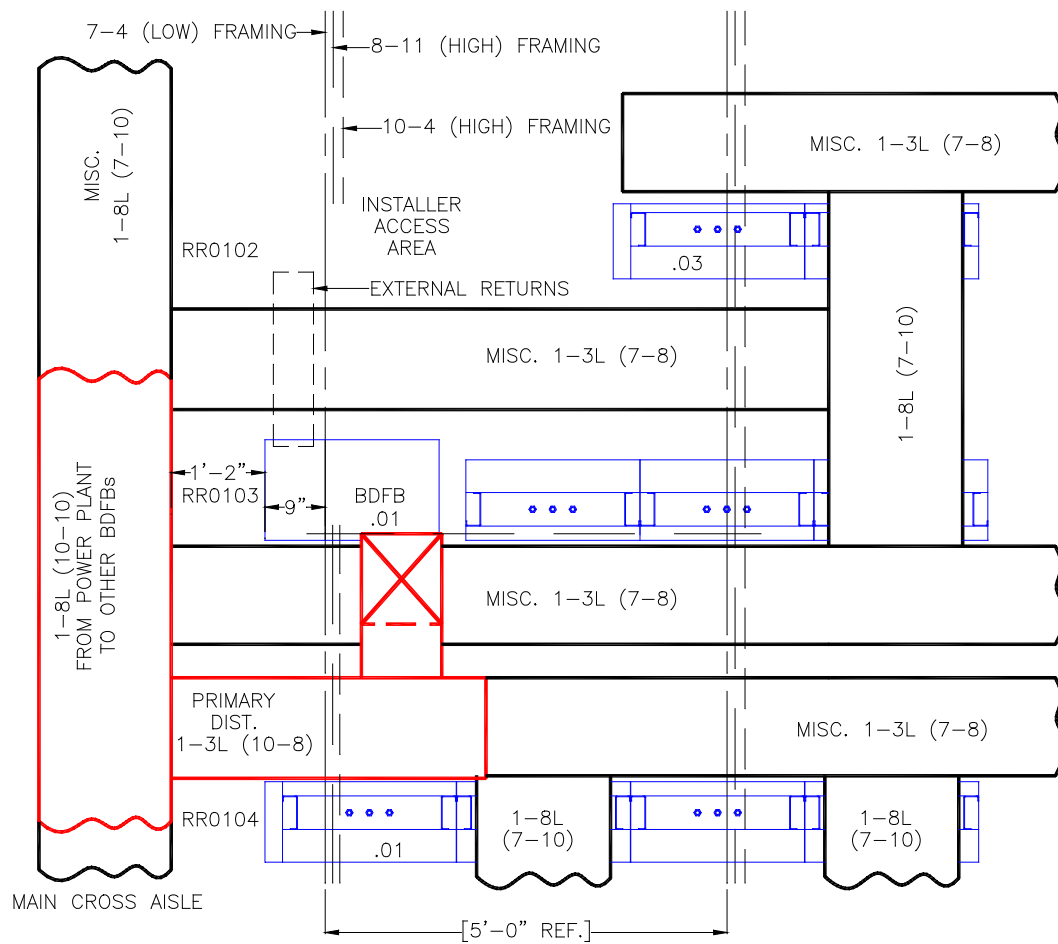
A – TYPICAL CROSS SECTION OF NEW AREA WITH 3-TIERED CABLE RACKING
